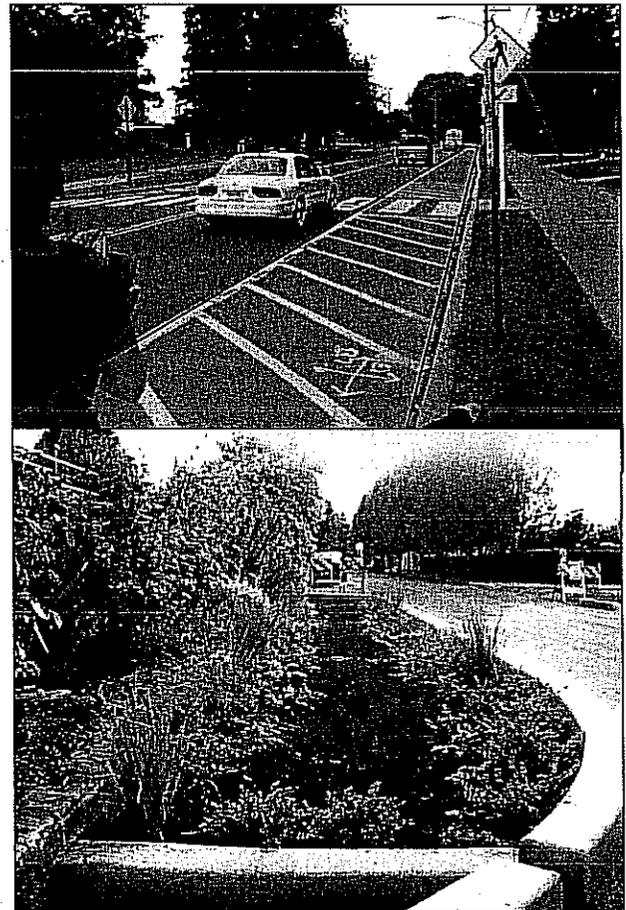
Remove pavement along existing road shoulder to edge of existing curb (top). Example street planters with curb cuts from Portland, OR (bottom).
